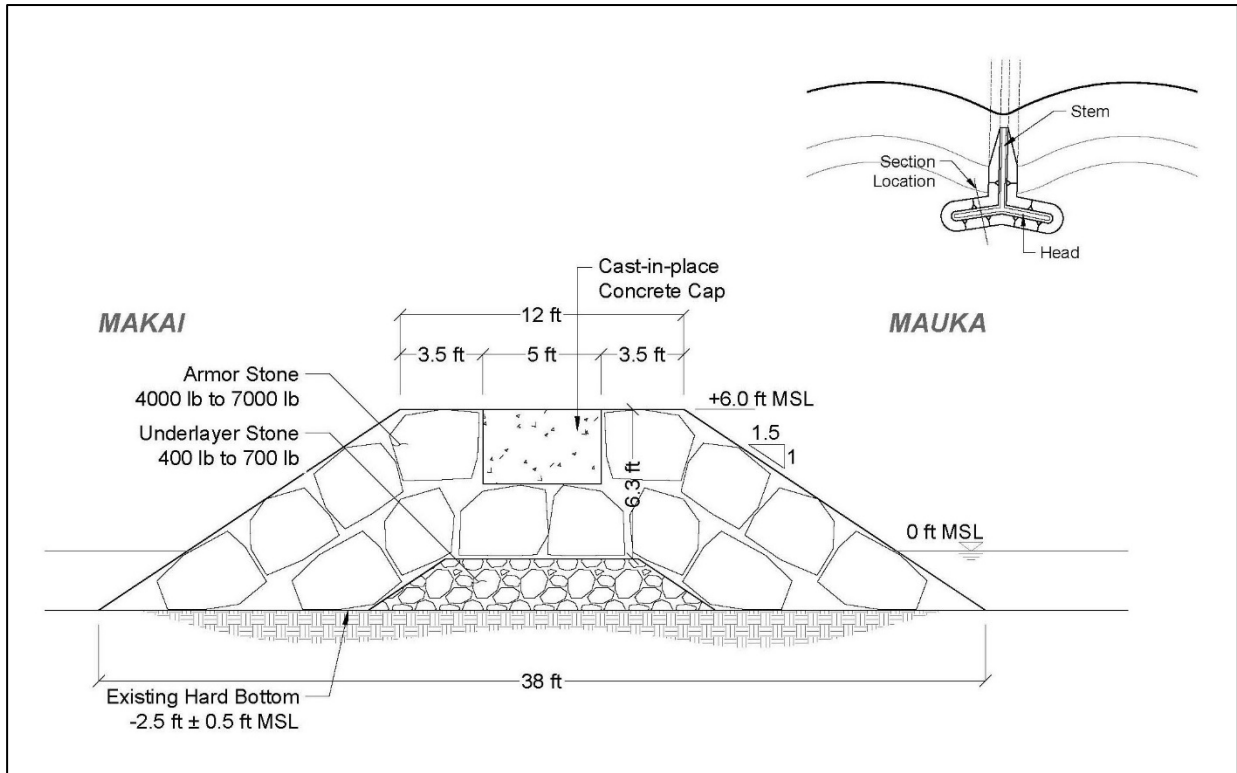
Section views of proposed groin heads – Halekūlani beach sector
